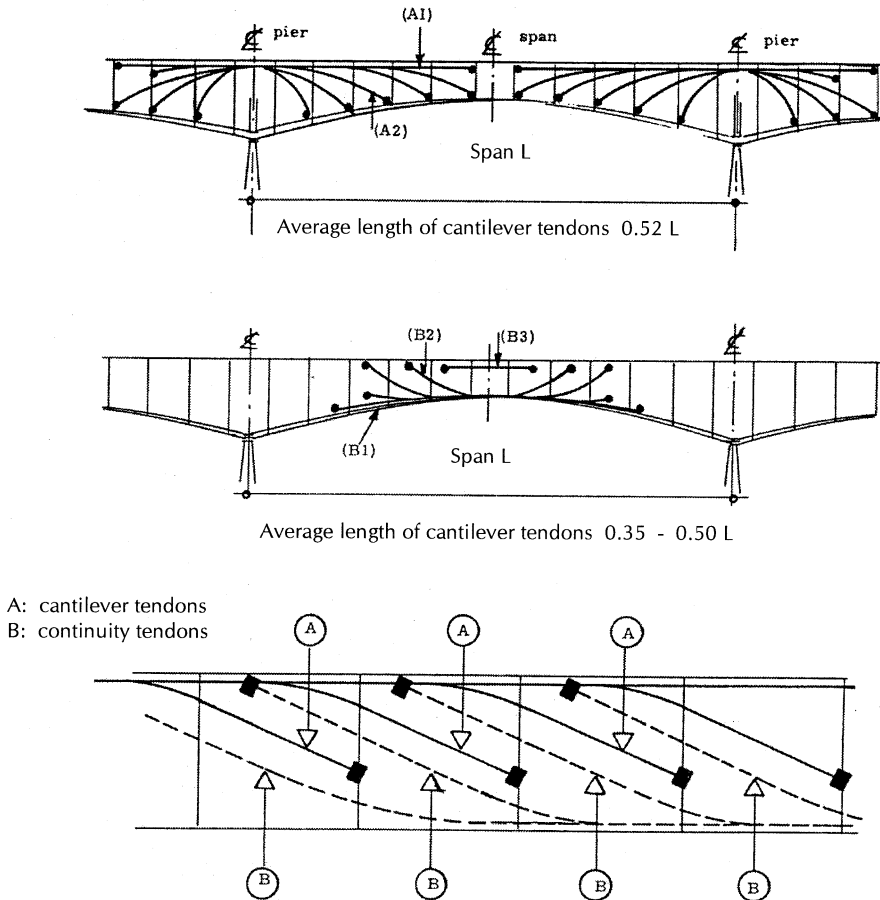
Typical post-tensioning layout for internal tendons.
